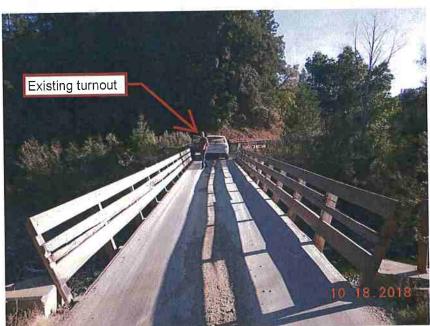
RP3. 9' x 64' bridge on Dutyville Rd. No sight distance restriction. Turnouts provided. Facing south. Clear Existing turnout of debris and maintain.
